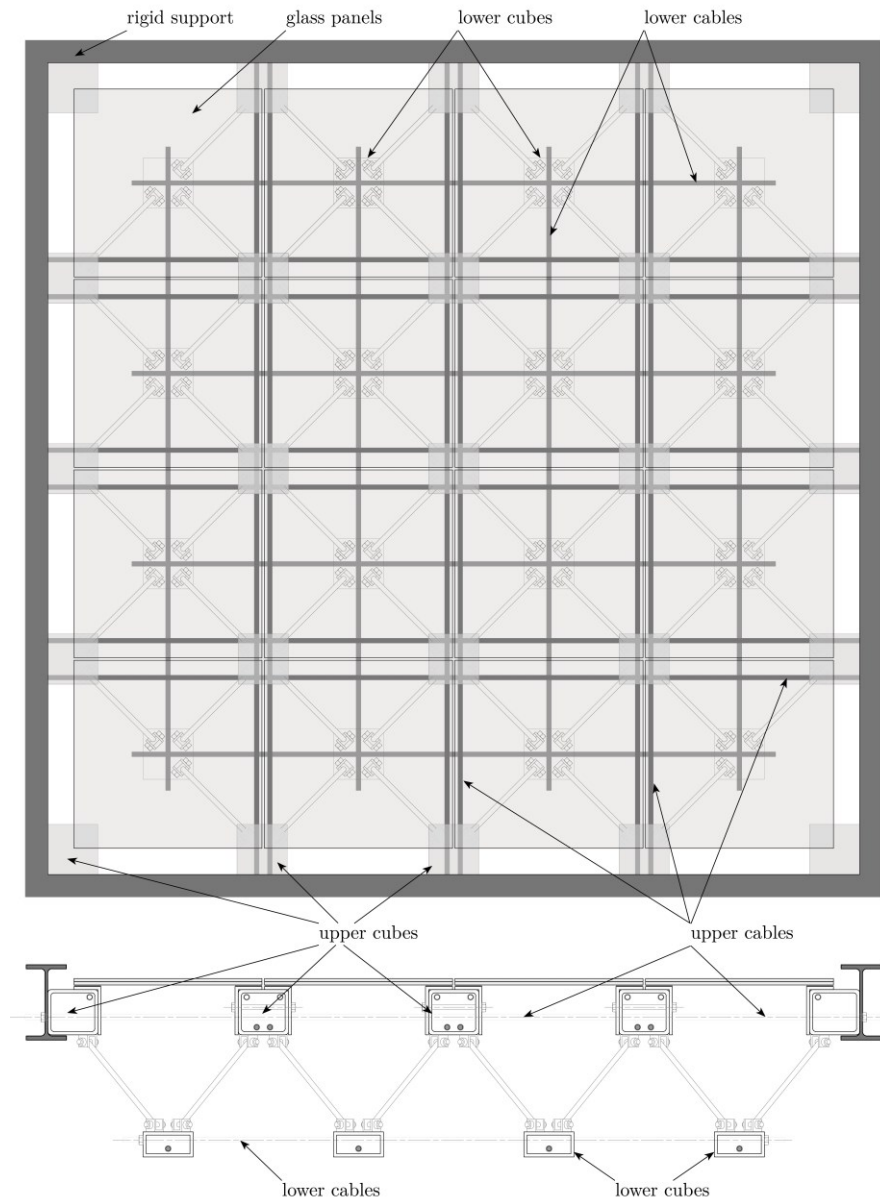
“Tensegrity Floor” prototype, plan and section view.
